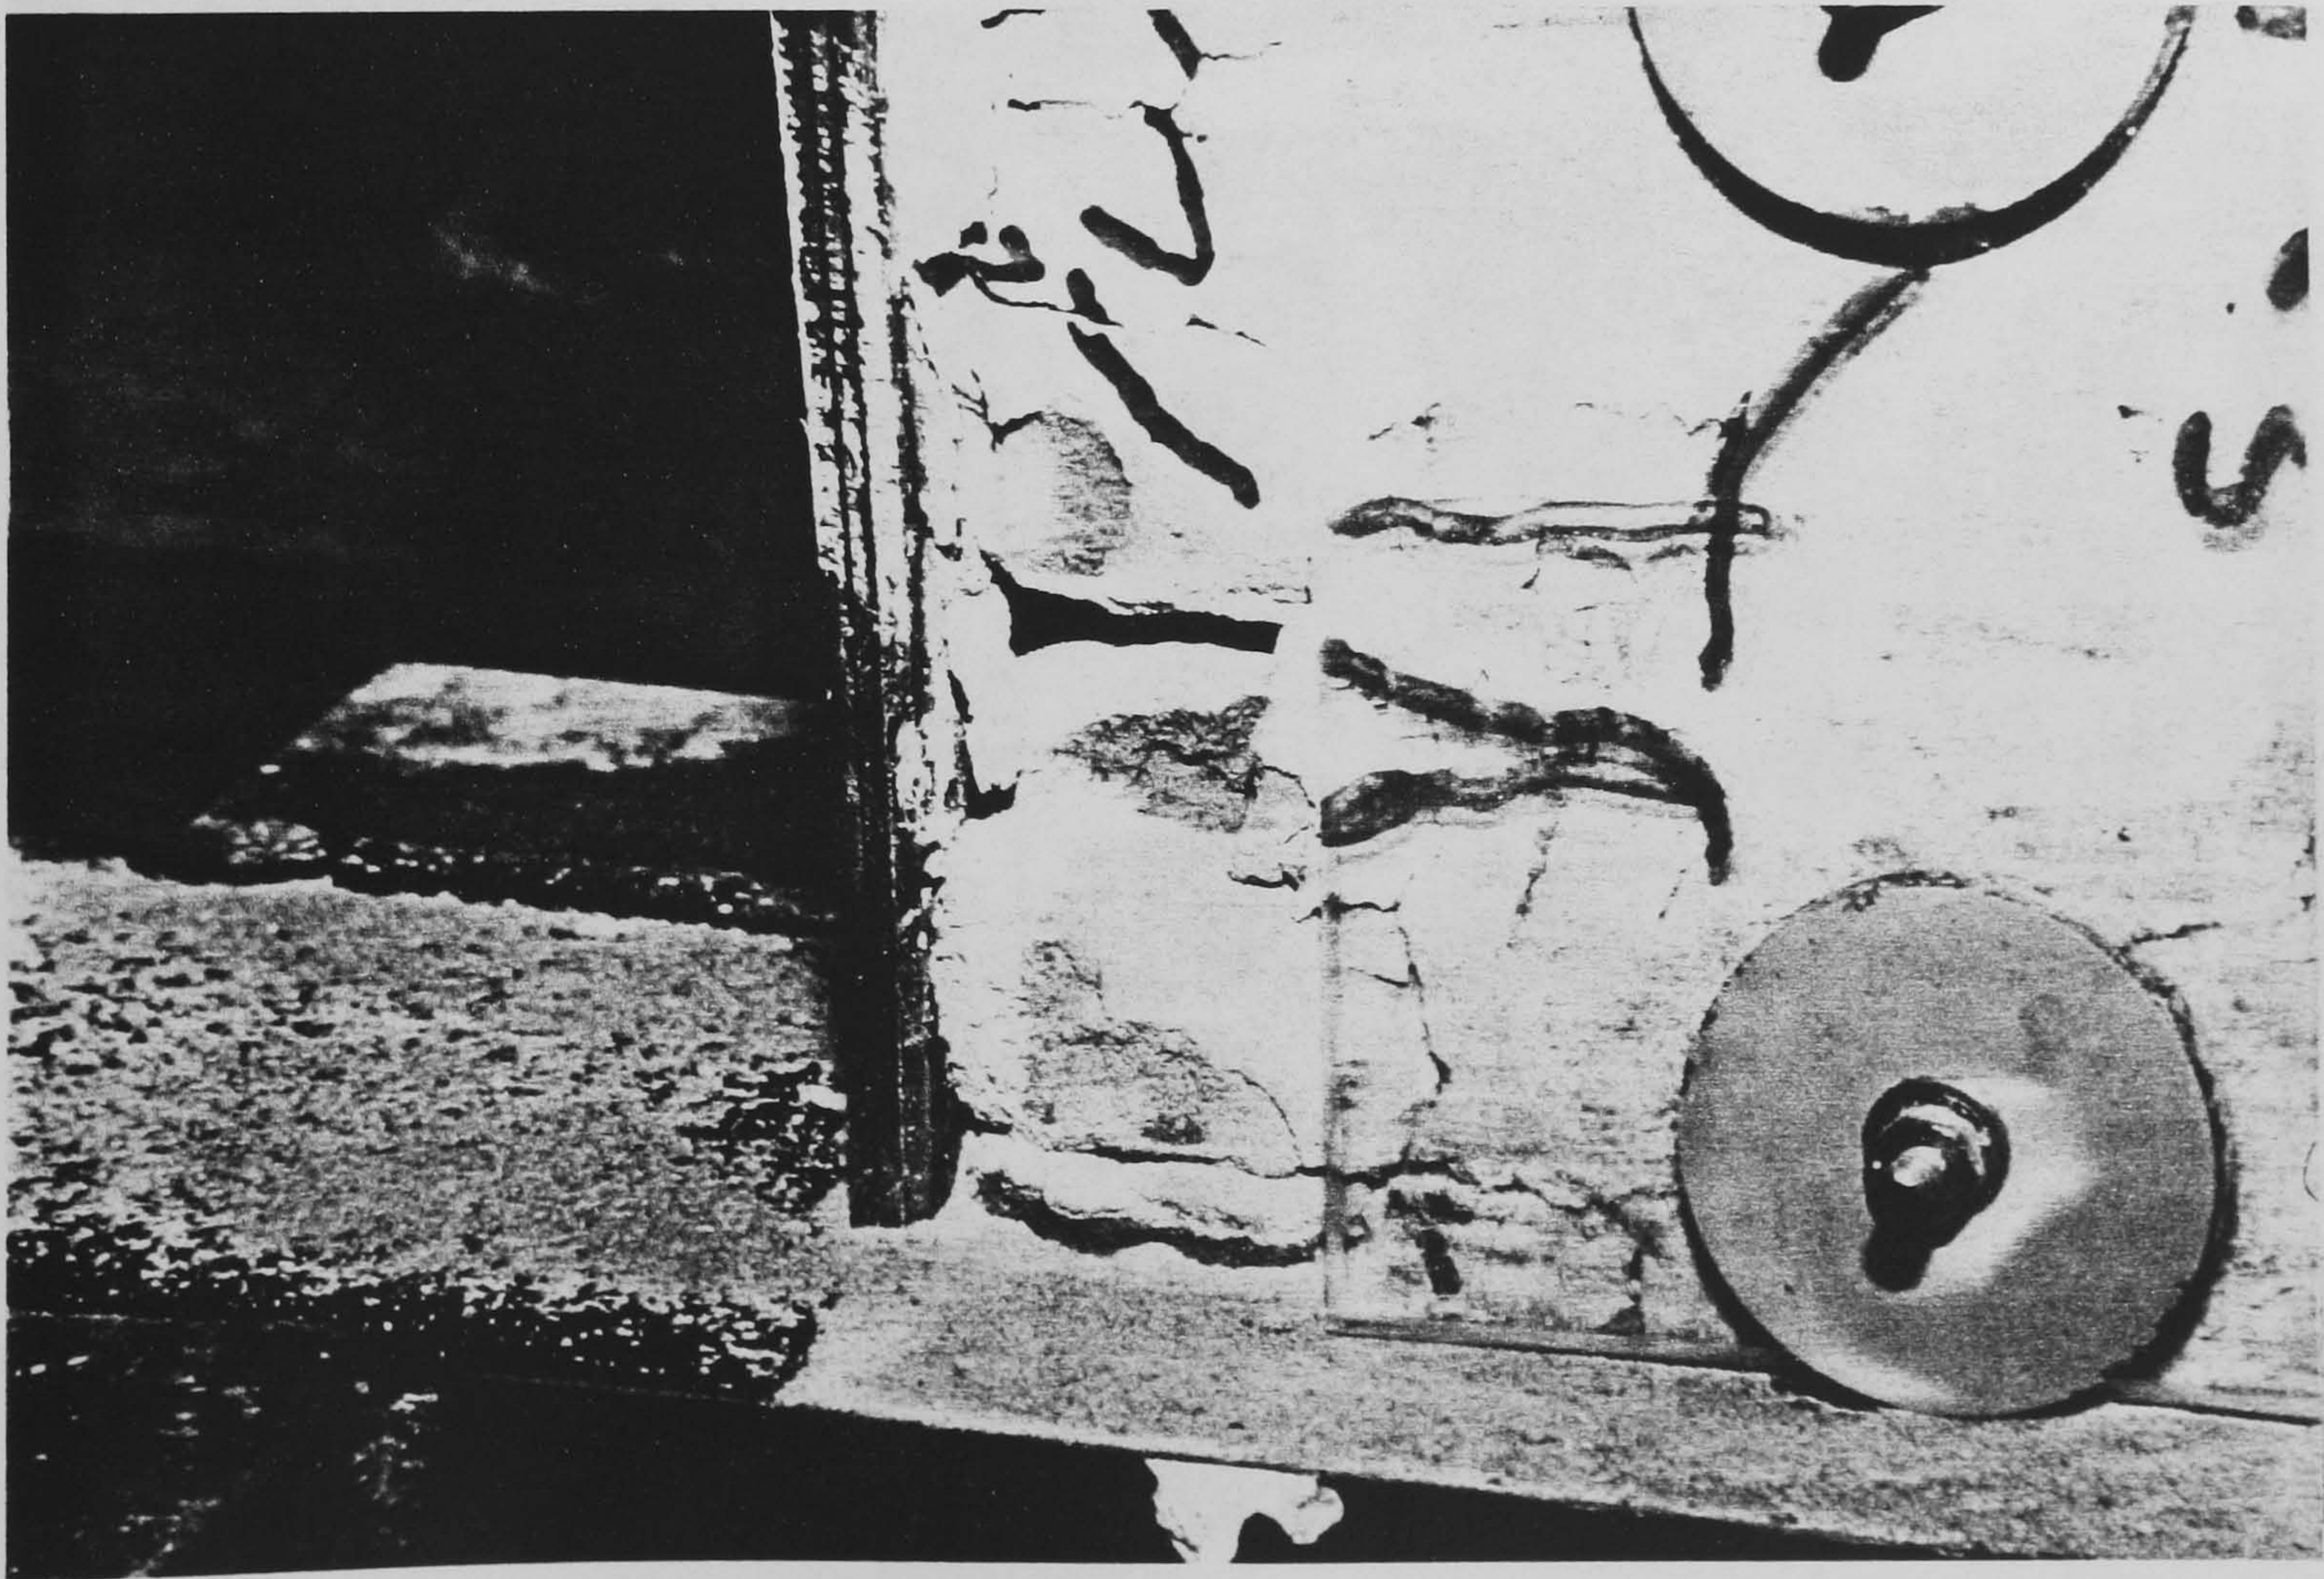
Close-up detail of lower left corner crushing (wall-M)
